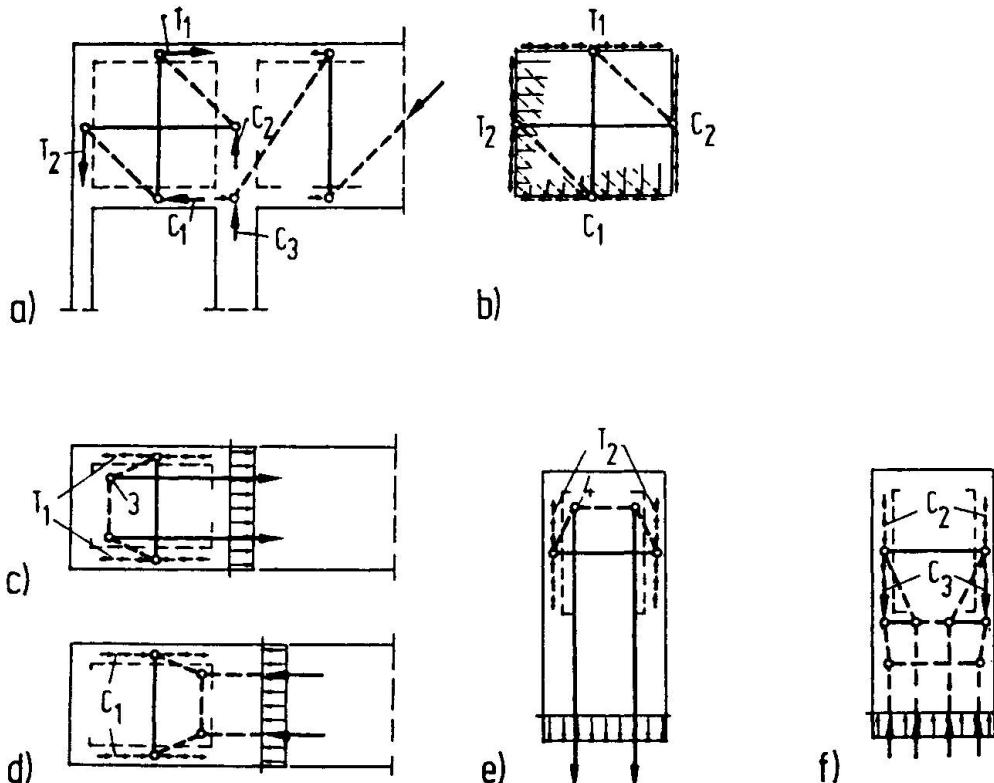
Strut-and-tie models for the structure with internal diaphragm wall. a) Basic model for the web; b) refined model for the web with smeared forces. c) Top flange. d) Bottom flange. e) Tensile wall. f) Compression wall
